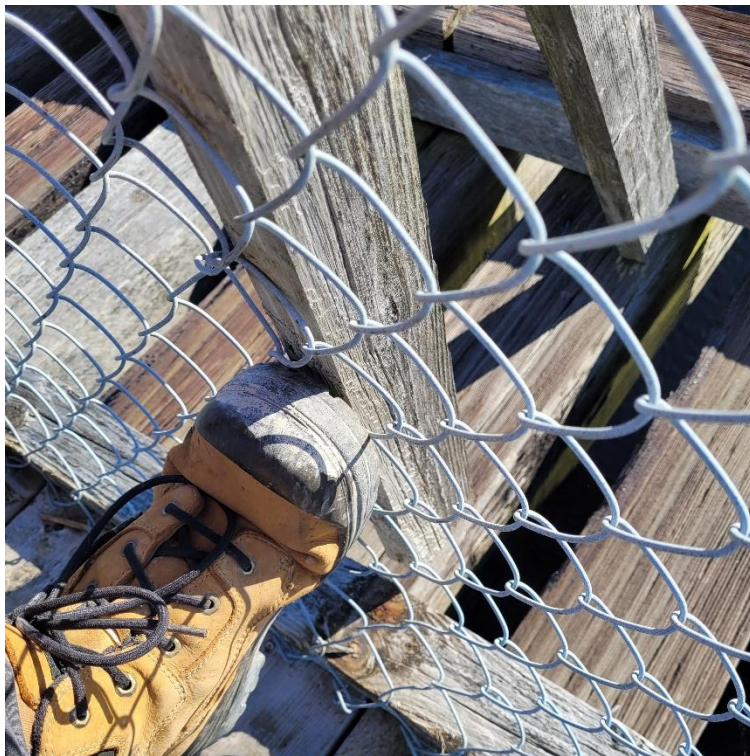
Typical view of a barrier post completely disconnected, south barrier.
